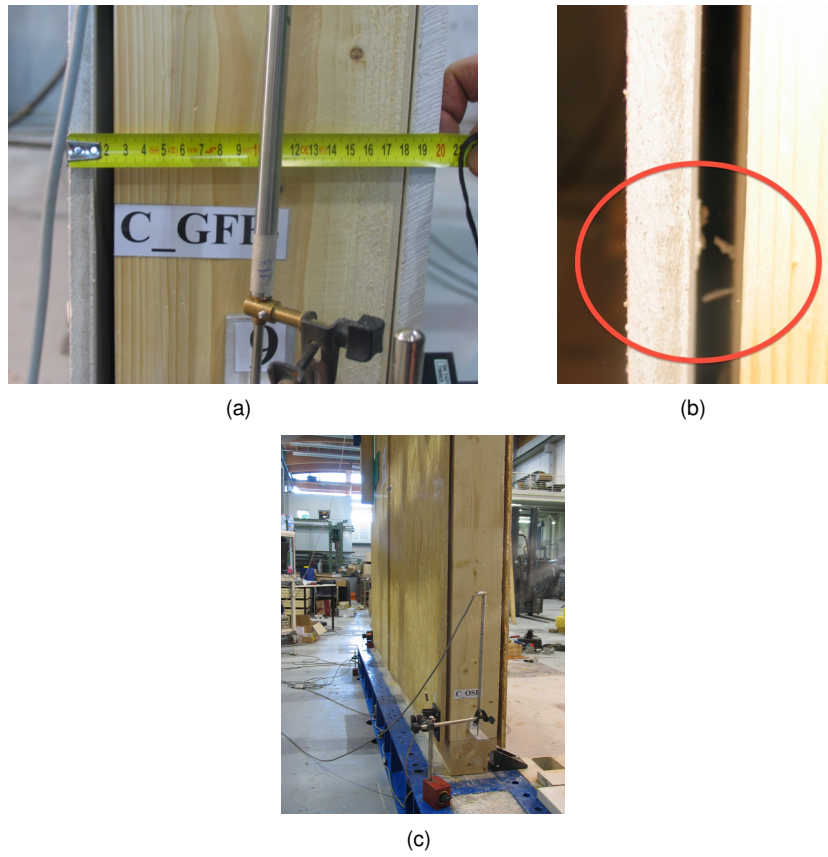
Failure of the connection between timber frame and sheathing panels.
